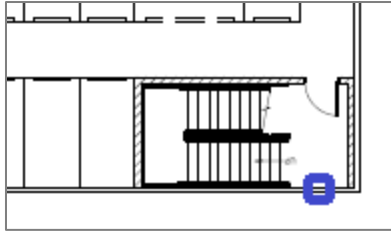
example floor plan stairwell approximate window location marked in blue
